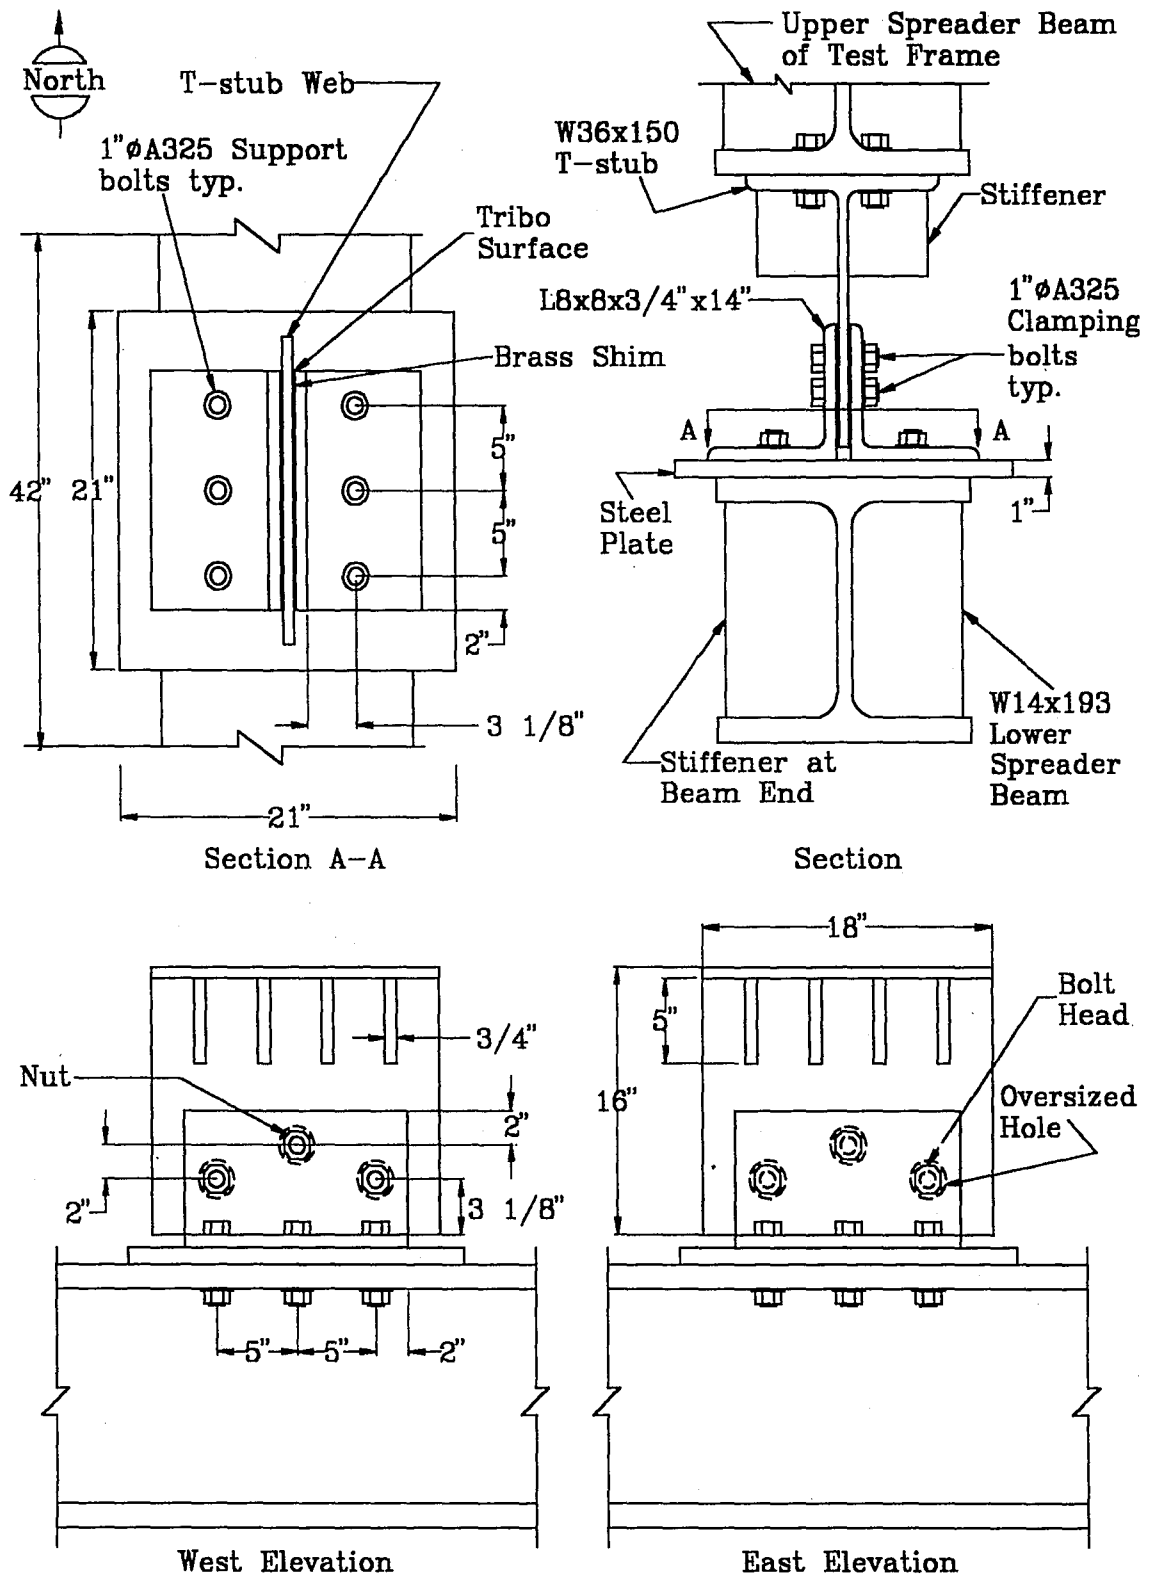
Double Plate Friction Specimen Instrumentation Plan
